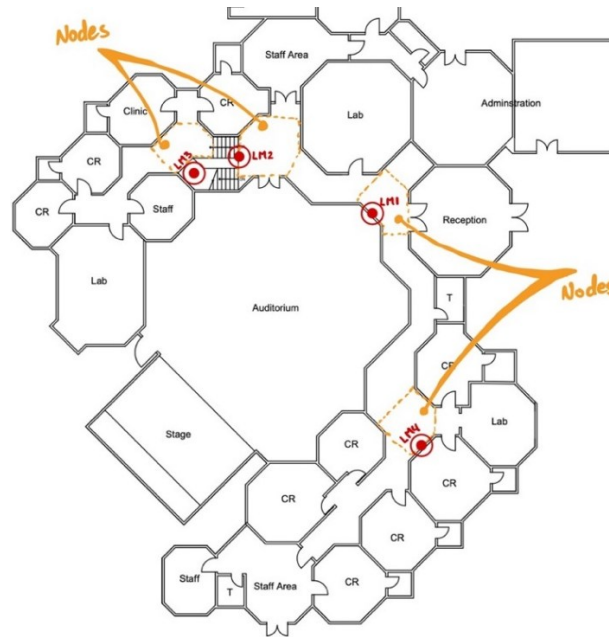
Floor plan of building 2 indicating the location of the landmarks (Source: Author).
